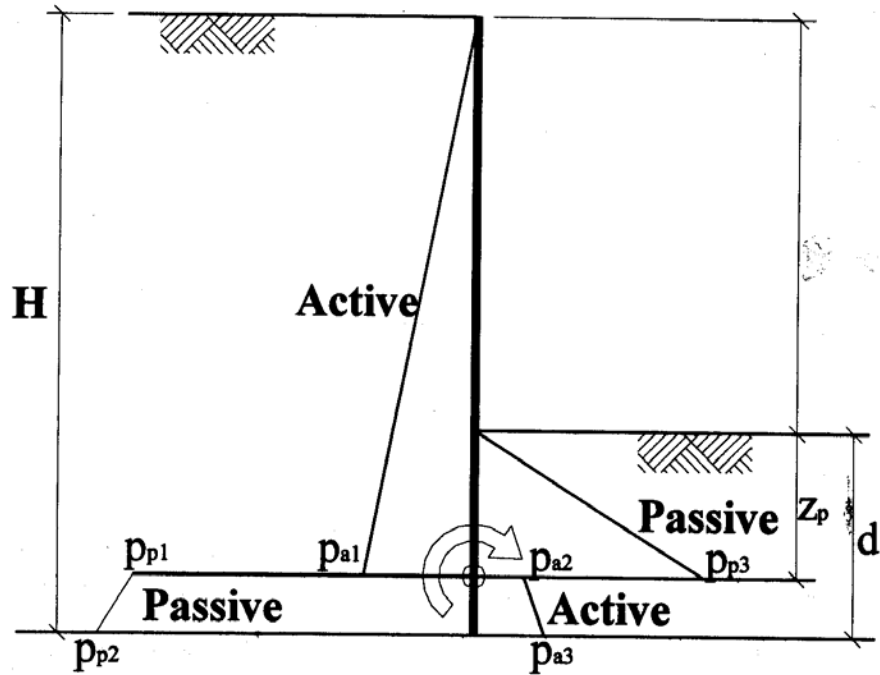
Limit equilibrium analysis of retaining wall (after Bolton and Powrie, 1987)
